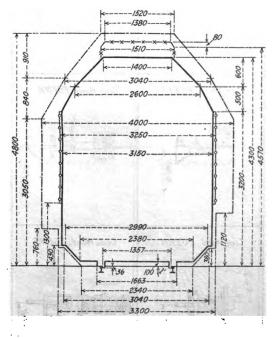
Clearance Diagram—Dimensions in m.:
